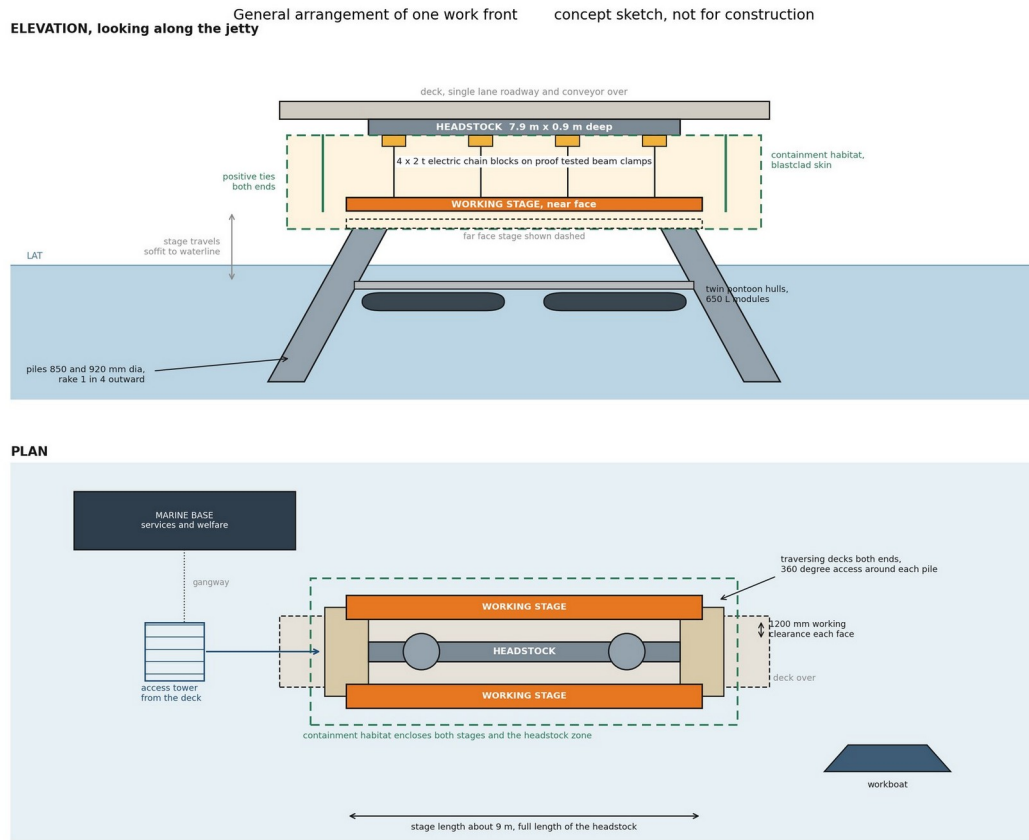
General arrangement of one work front, elevation and plan. Two stages hang on the long faces of the headstock on four 2 t electric chain blocks each, with traversing decks at both ends giving access around each pile. Concept sketch, not for construction.
